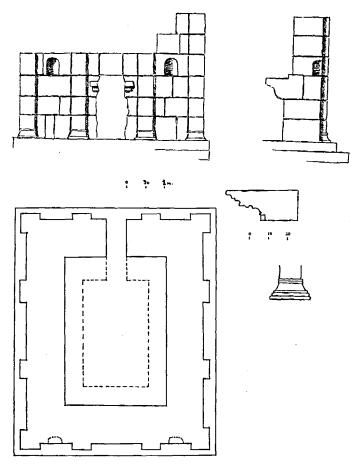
Mausoleum near Gürün. Plan, elevation, and details
